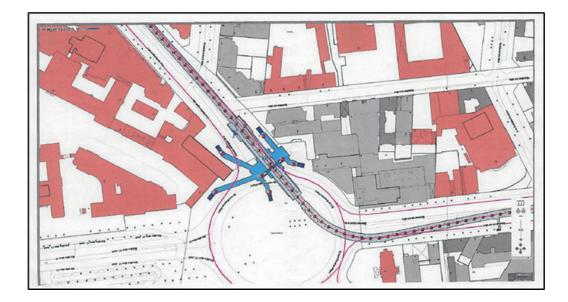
Metro demonstrator system at Ernst Reuter Platz Station in Berlin.
